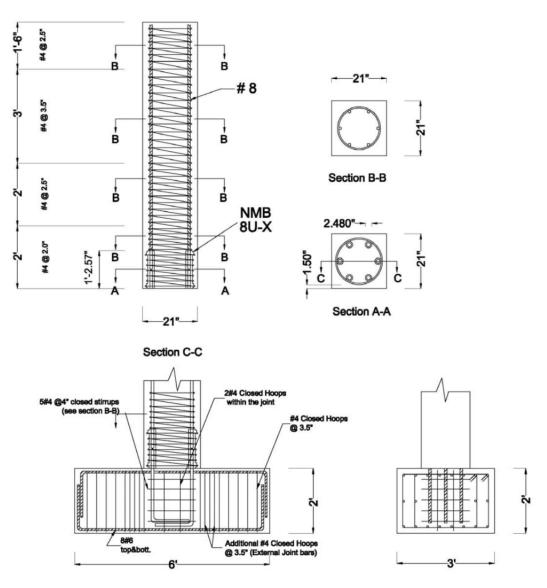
Column and footing details for the column to footing tests using NMB splice sleeves.
